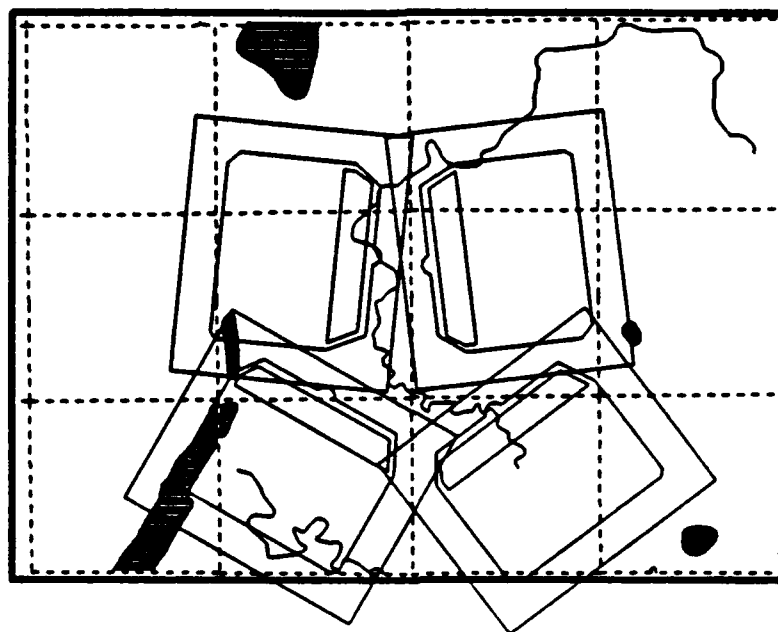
TX-SOUTH PRELIMINARY SITE LAYOUT
